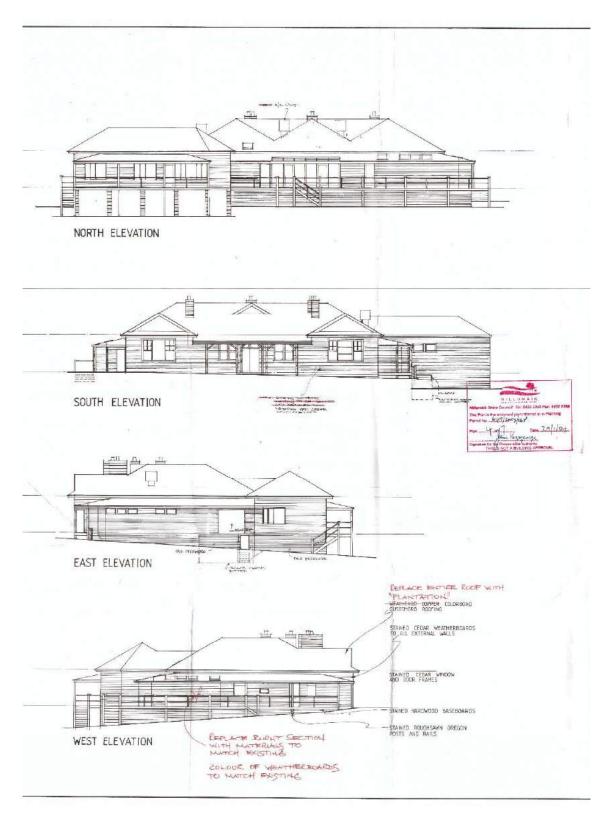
Plans for refurbishment work to the Panton Hill Hotel after fire damage, 2003. (Source: BP).
